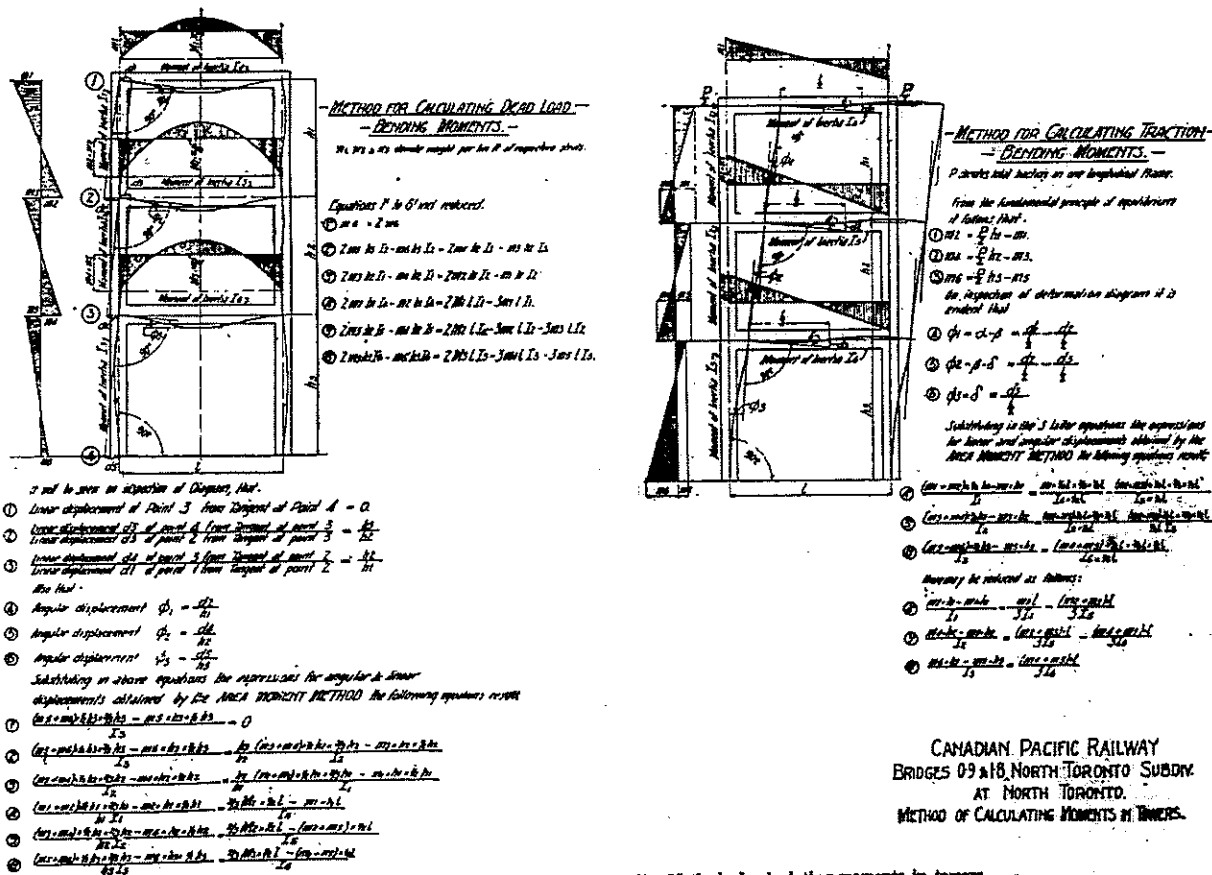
Bridges on North Toronto Subdivision, C.P.R. Method of calculating moments in towers.
